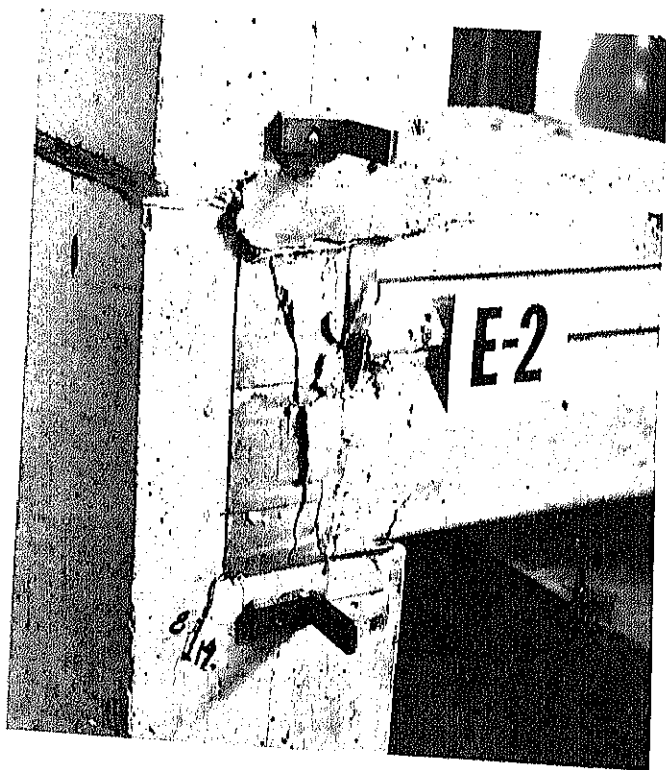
Damage Pattern at Ultimate Load - Exterior Joints
